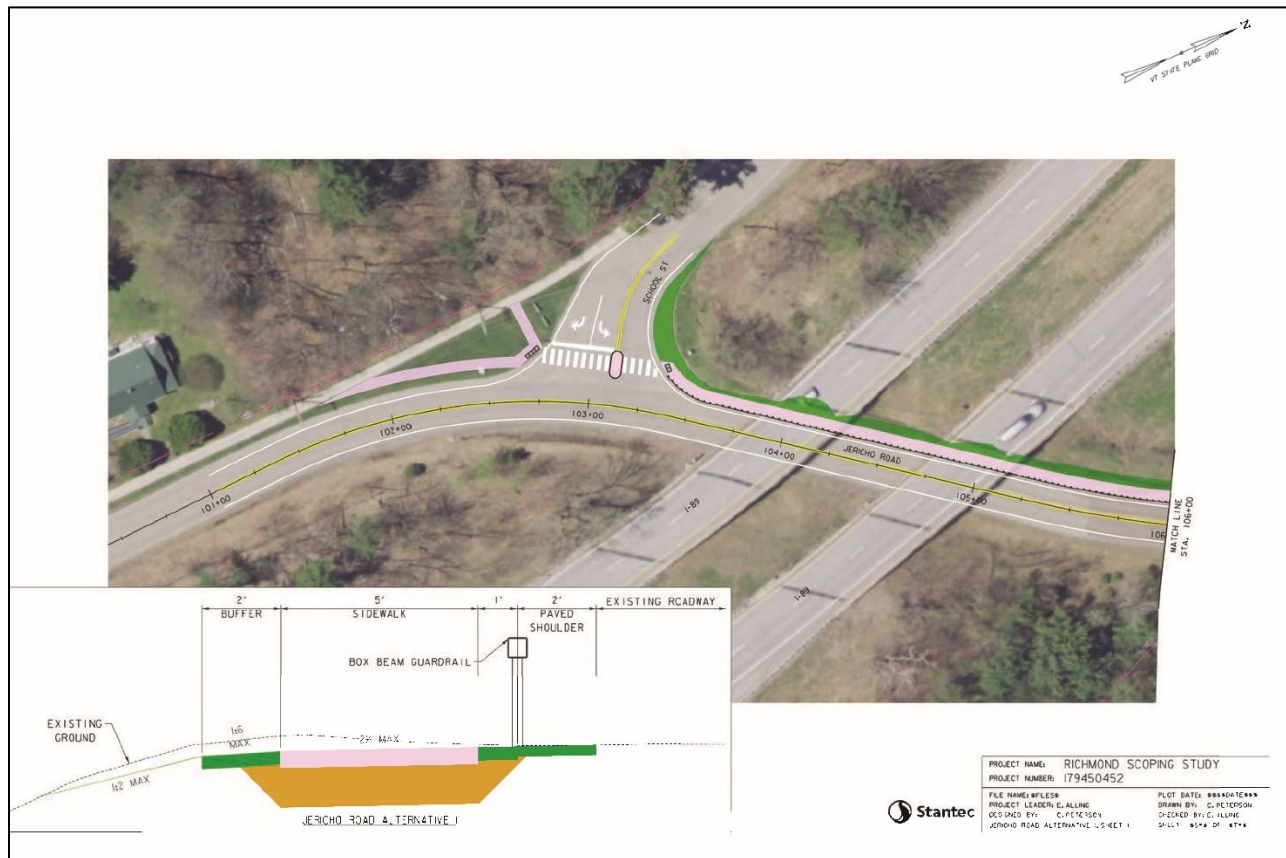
Jericho Road - Alternative 1 Typical Section
